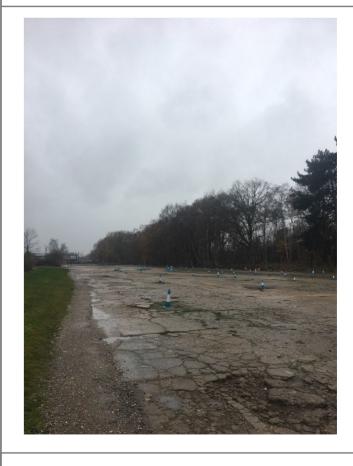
View of western boundary with concrete drainage passage in SA-20.
